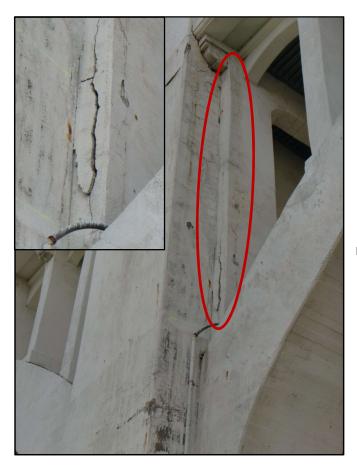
Cracked & Spalled Surfaces (Circled) on Lower Deck Column SE 1, Span 9. (Inset: Loose concrete near column base, south face.)
